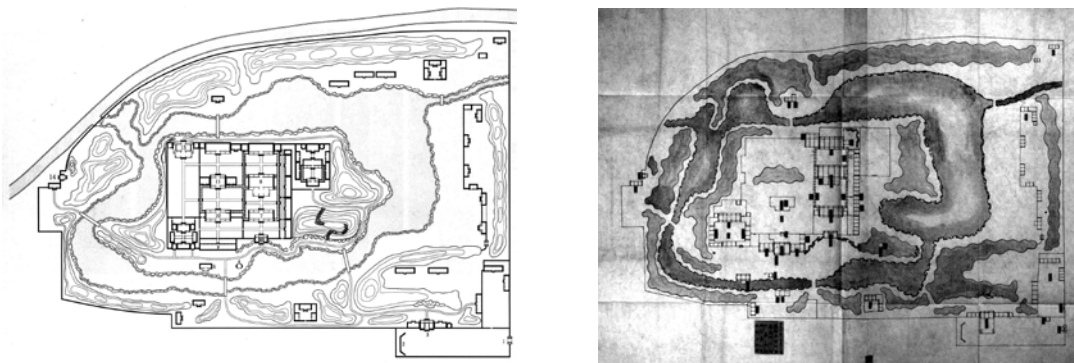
11 The Plans of Langrun Garden Before and After Rebuild
